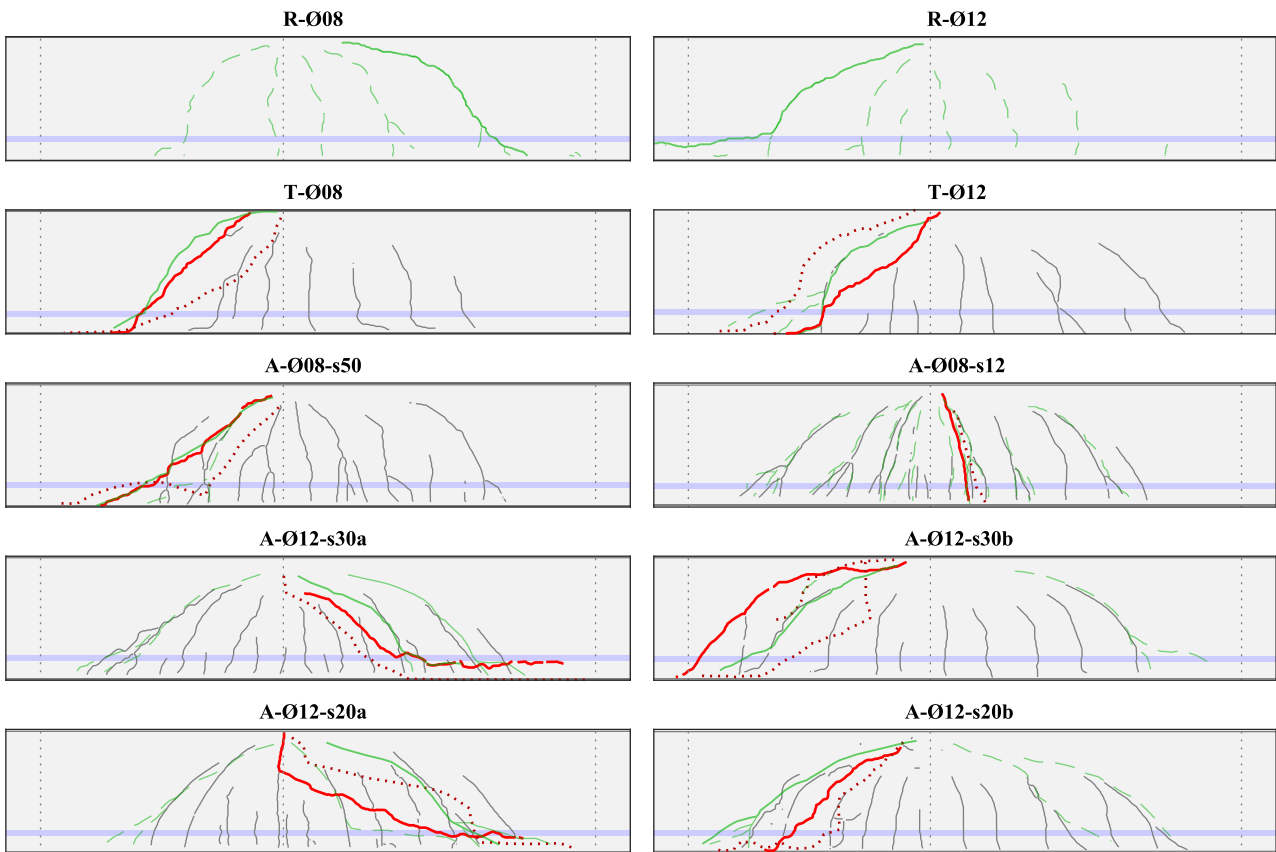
Crack patterns of all specimens with the governing crack in the concrete as solid green line, secondary concrete cracks as dashed lines, the failure cracks in the textiles as red lines (solid on front side, dotted on back side of the specimen), and the cracks in the textile determined at the last load stage before debonding as grey lines.
